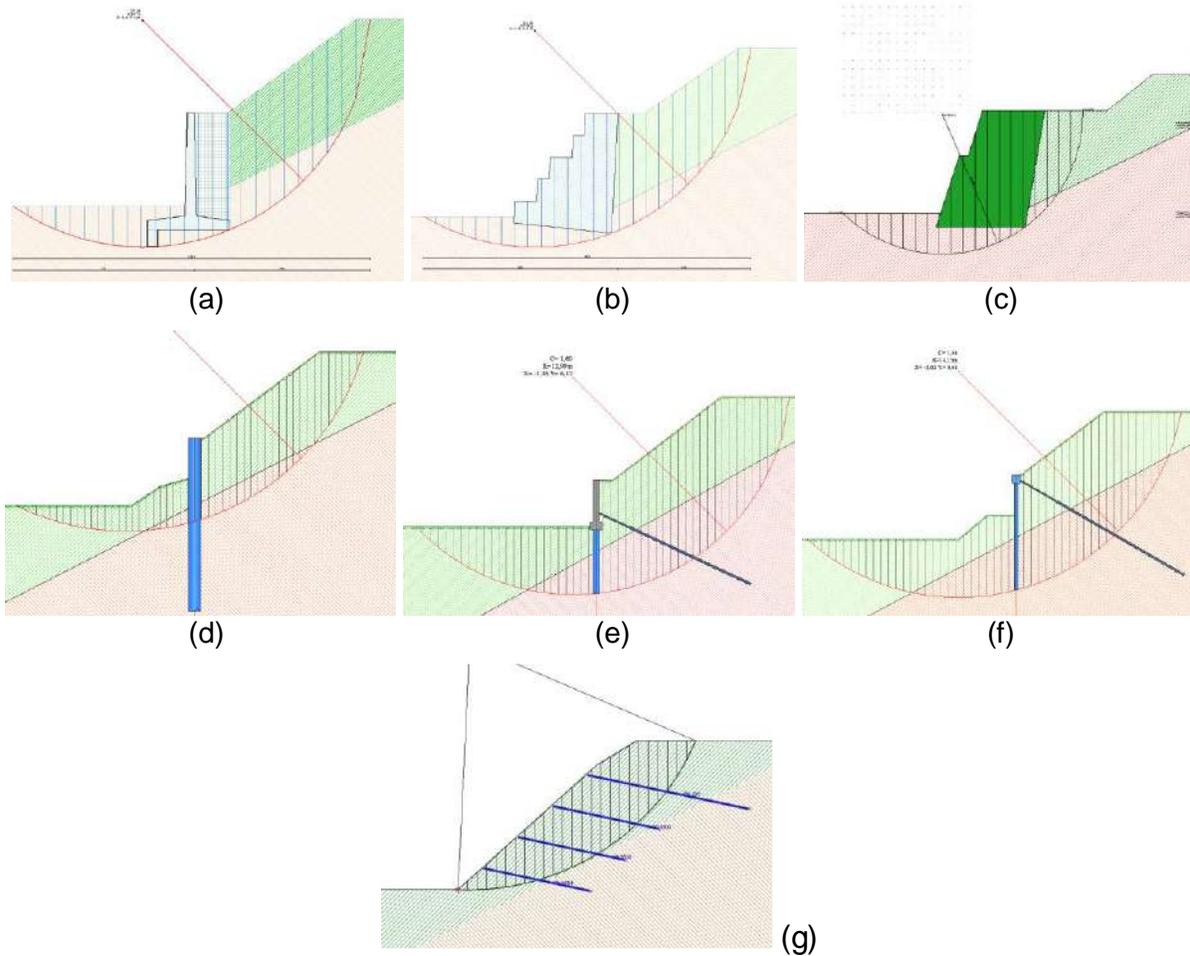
Interventions for the reference case: cantilever concrete retaining wall (a); gabion retaining wall (b); reinforced earth wall (c); line of drilled piles (d); tie-back micropile wall (e); tie-back wall with micropile (f); soil nailing (g).
